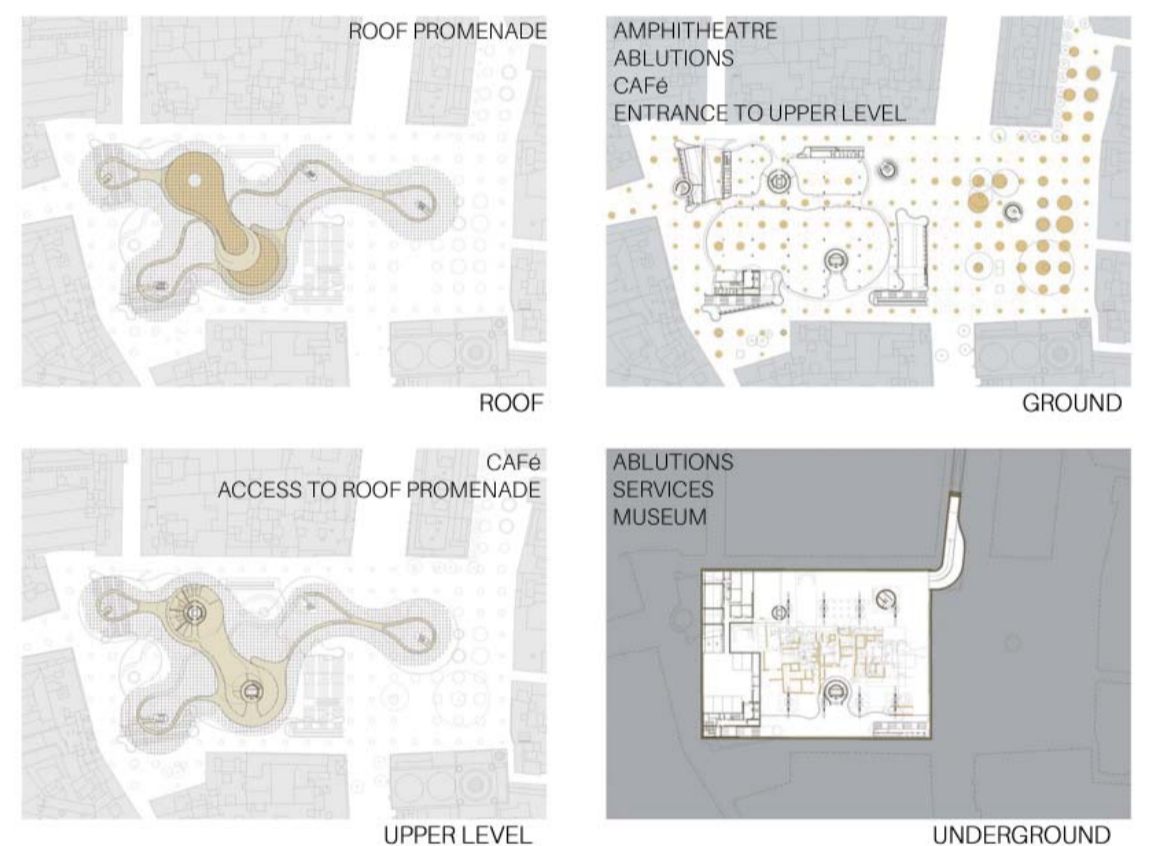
Metropol Parasol floor plans.psd (Zimmer 2011)
